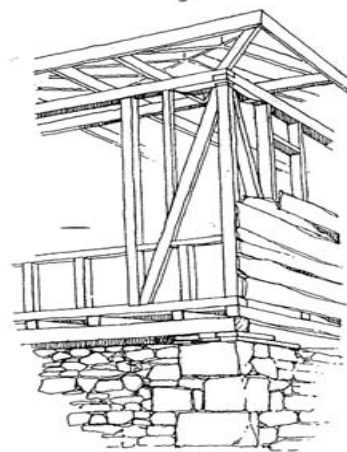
Structural order of timber framed buildings (Amadio et al., 2009)
